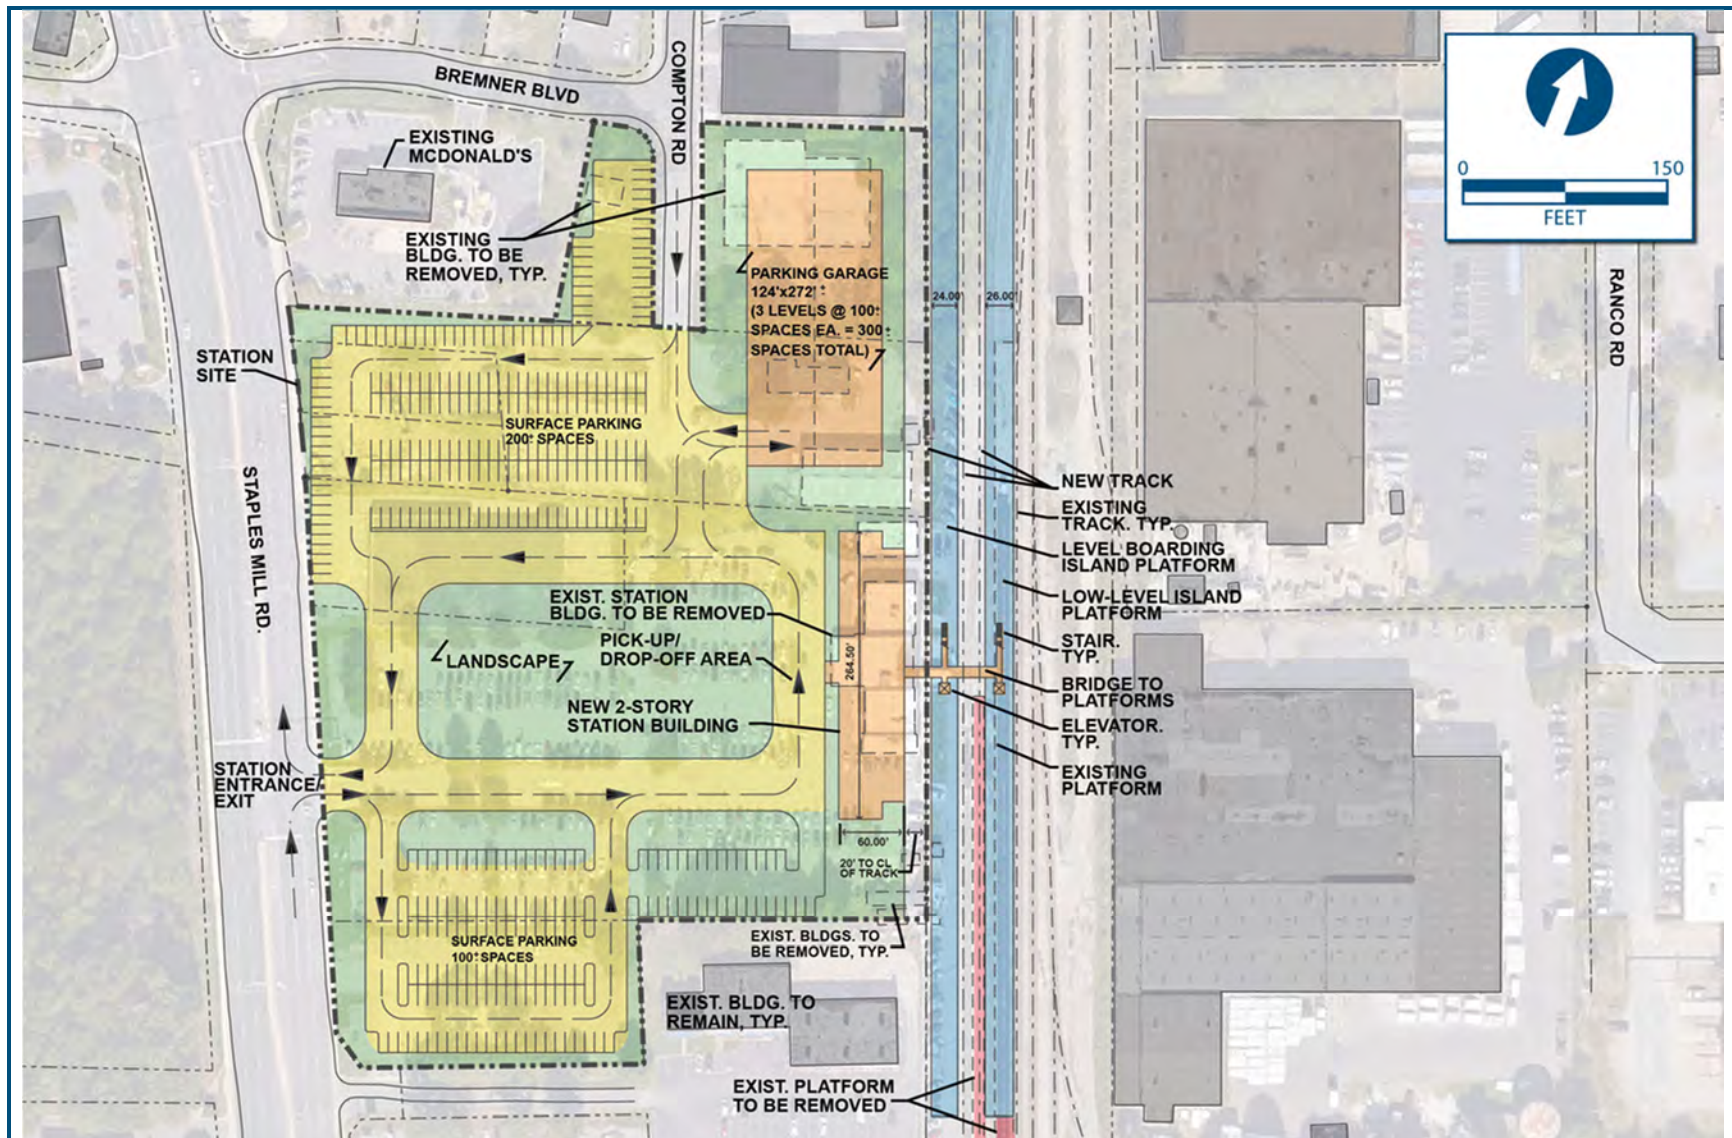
Staples Mill Road Station Improvements for Build Alternative 6E
